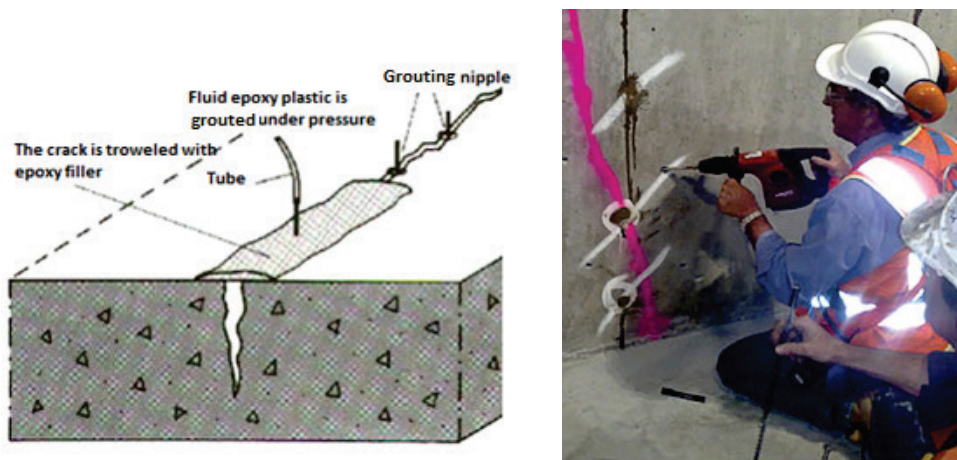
Preparations of epoxy grouting of crack
